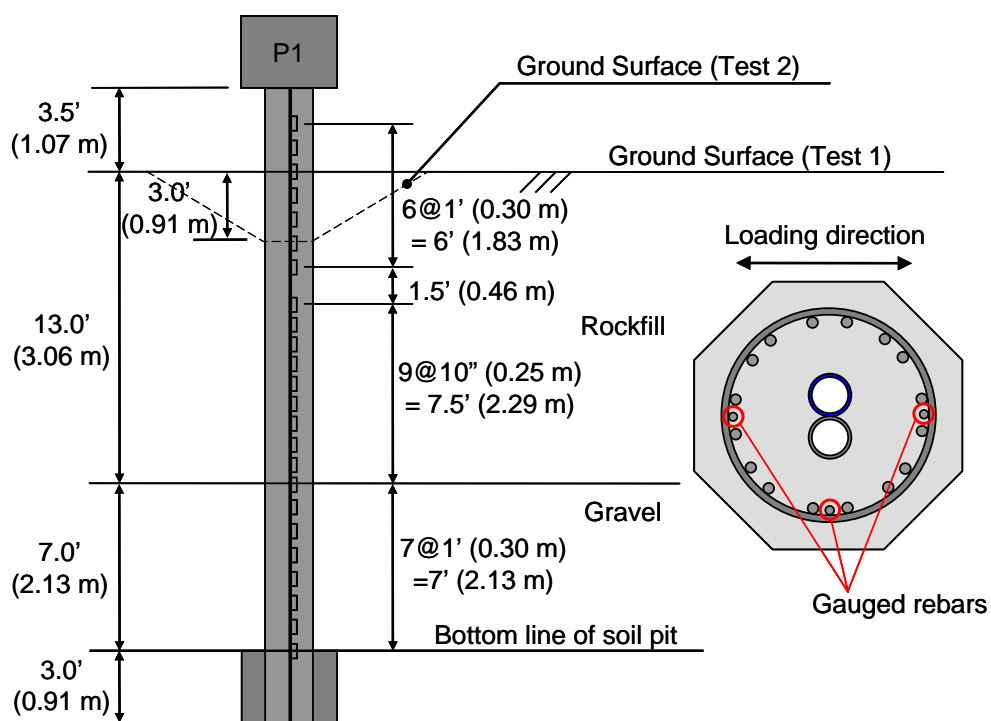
Elevations of strain gages along test pile for Single Pile Test
